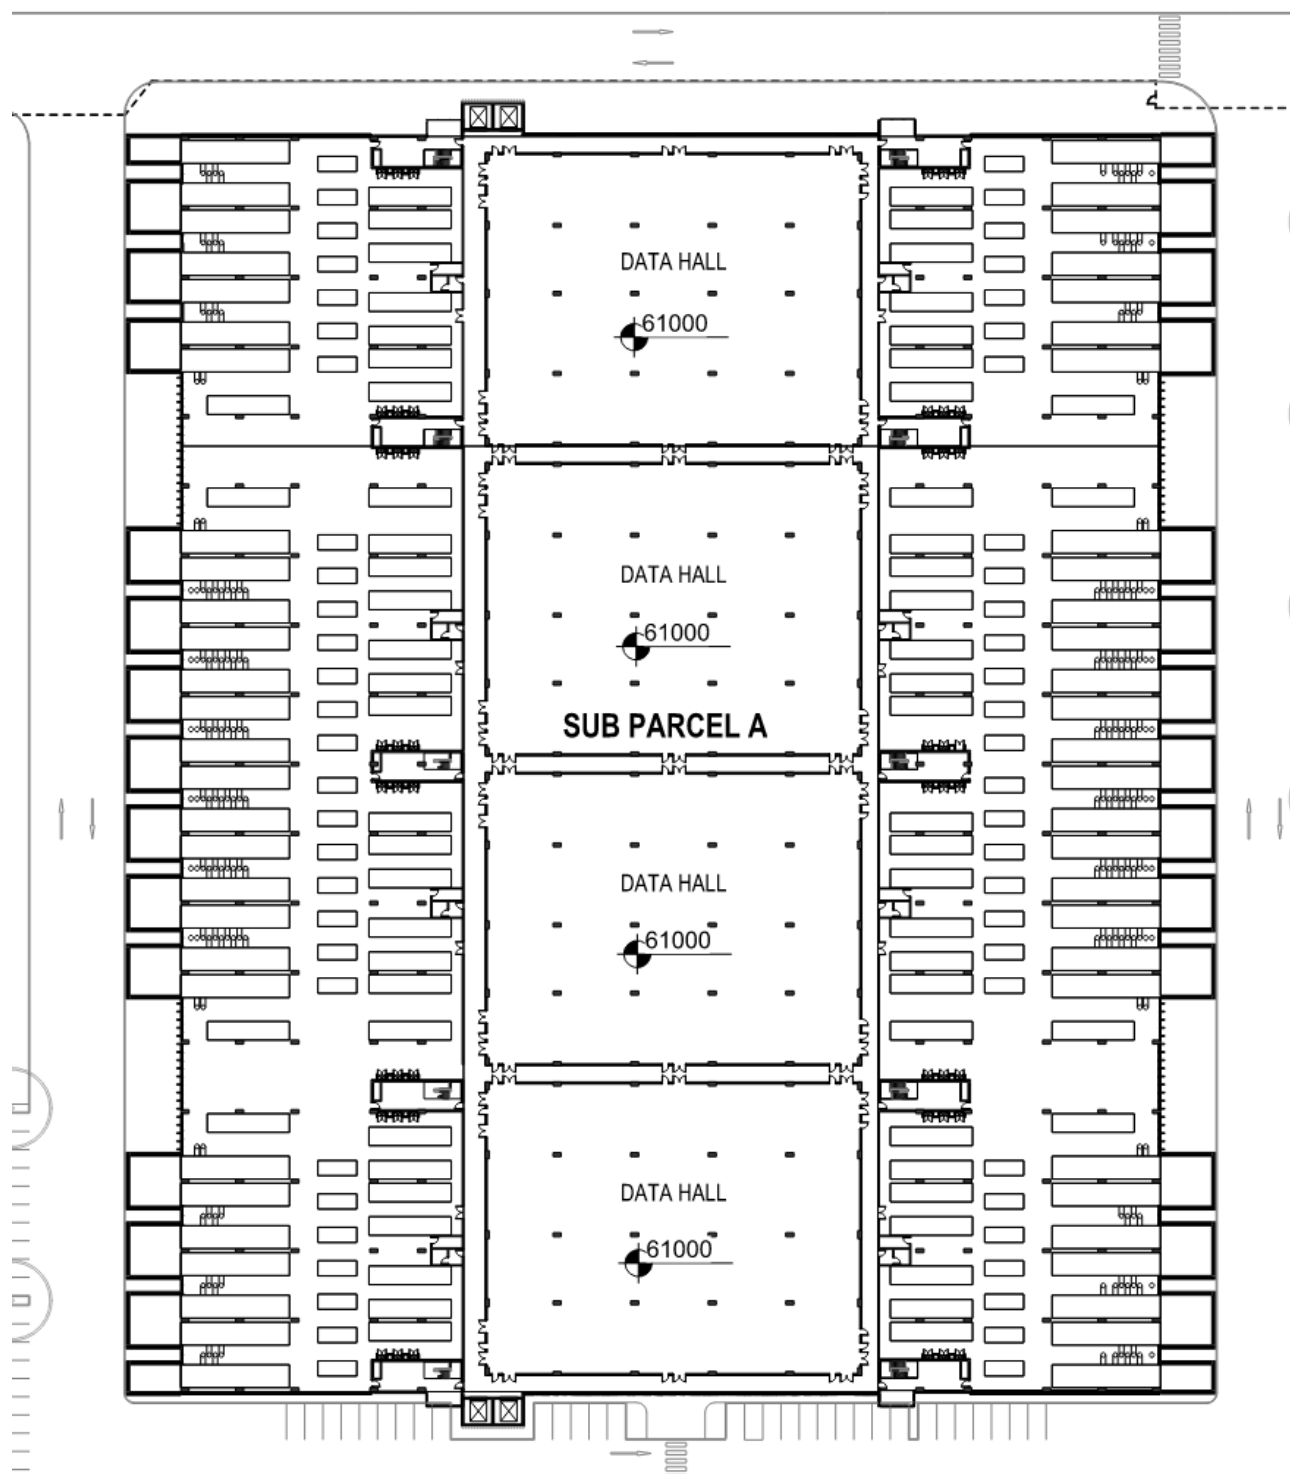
Level 1 Layout of Data Hall Building – Typical per Sub Parcel
